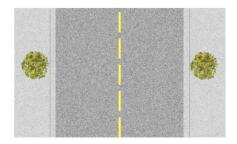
continued*Standard MPAH Cross Sections
